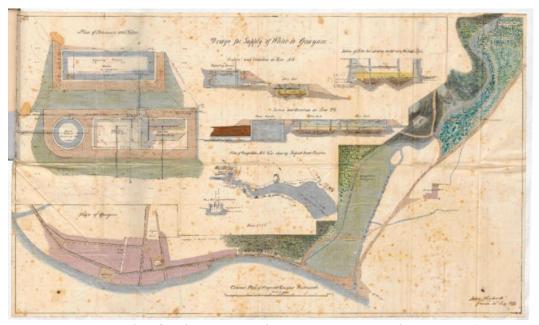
Extensive plan for the waterworks at Gouyave, St. John in 1879 (image: TNA)
